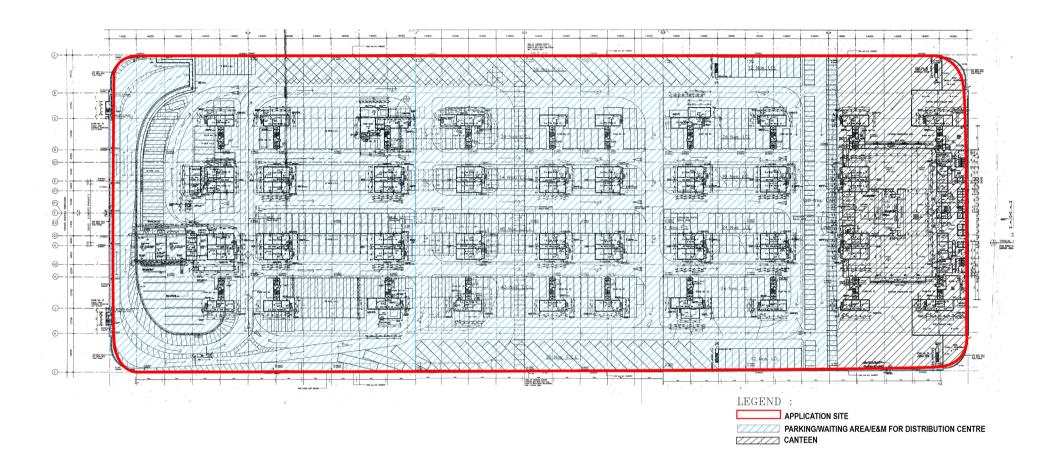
G/F Plan of the Existing Hutchison Logistic Centre
